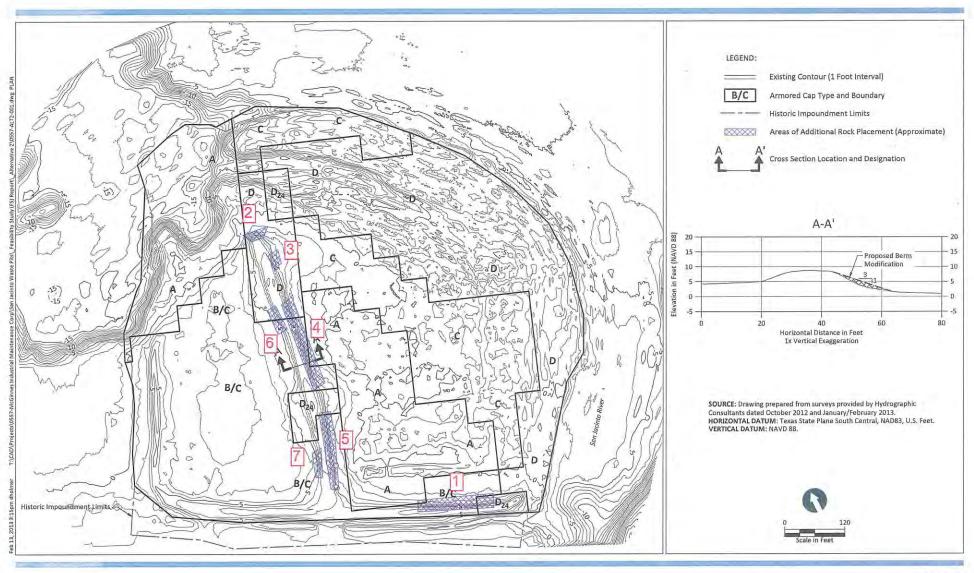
Additional Rock Placement Plan - Alternative 2 Post TCRA... San Jacinto River Waste Pits Superfund Site
